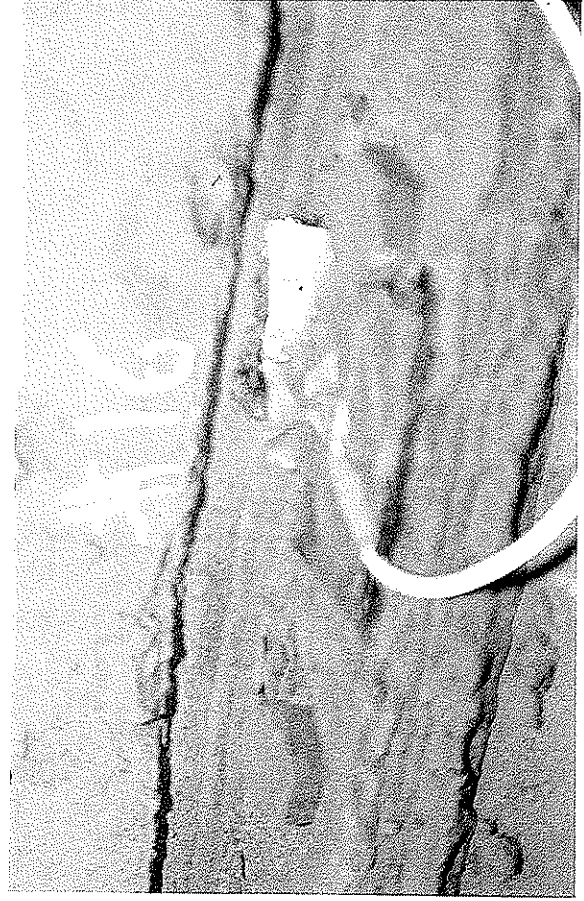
Span 2, Floorbeam 5 East, Gages D12 and D13
